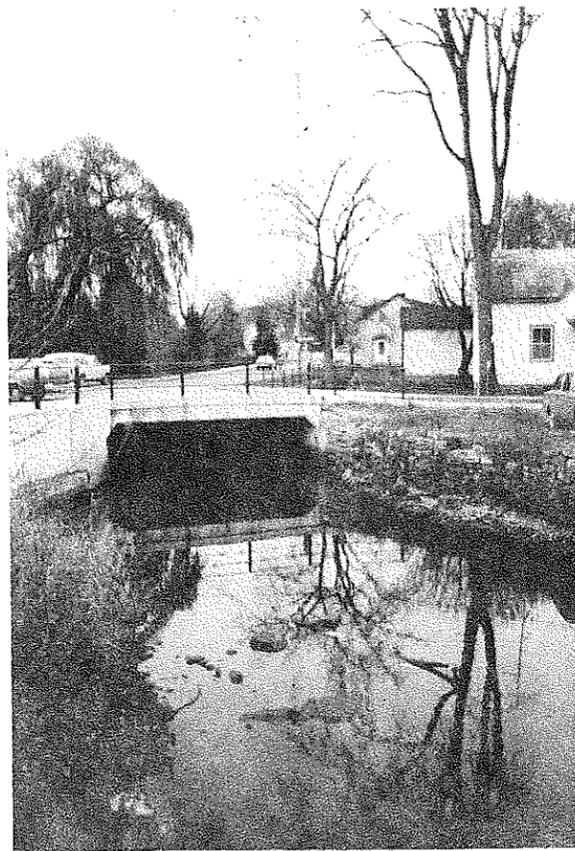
LOOKING DOWNSTREAM TO CONCRETE CULVERT AT DRUMMOND STREET
